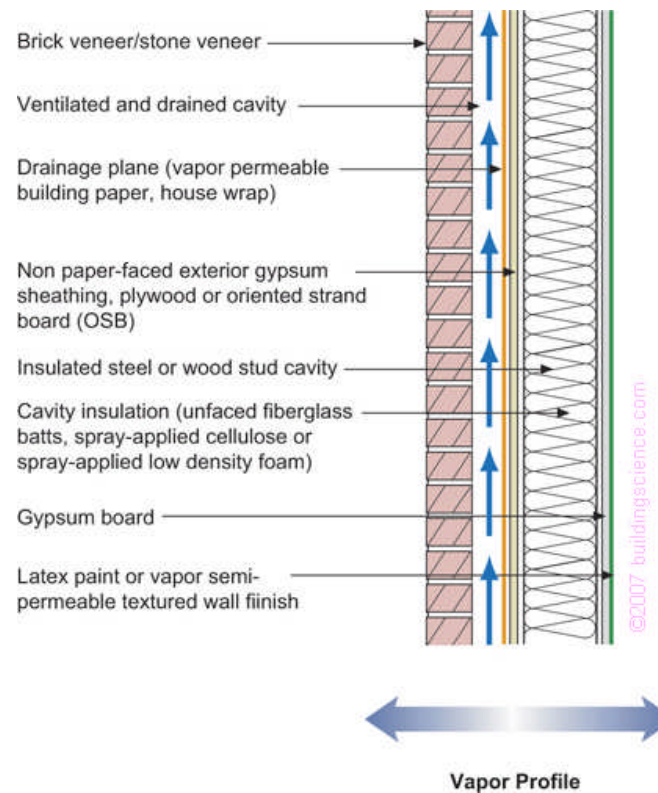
Frame Wall With Cavity Insulation and Brick or Stone Veneer
